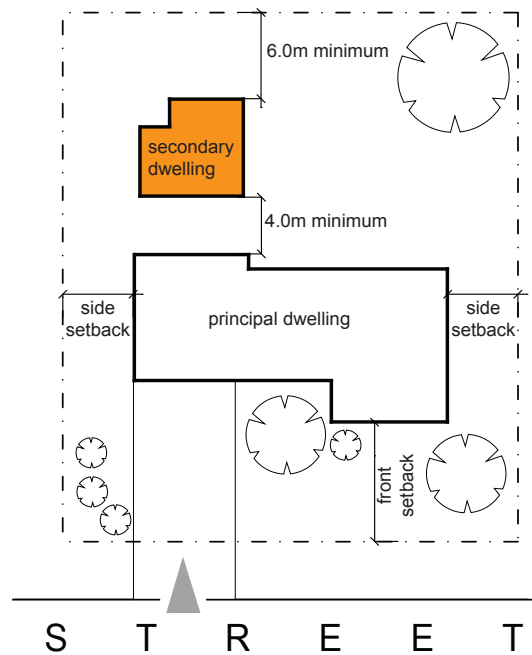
A.3-2: Setback controls for ground floor detached secondary dwellings.
